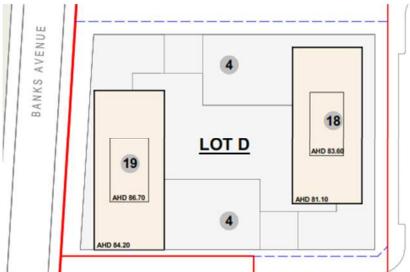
Building Heights extract for Lot D from approved Concept Plan (DA-2019/386)
